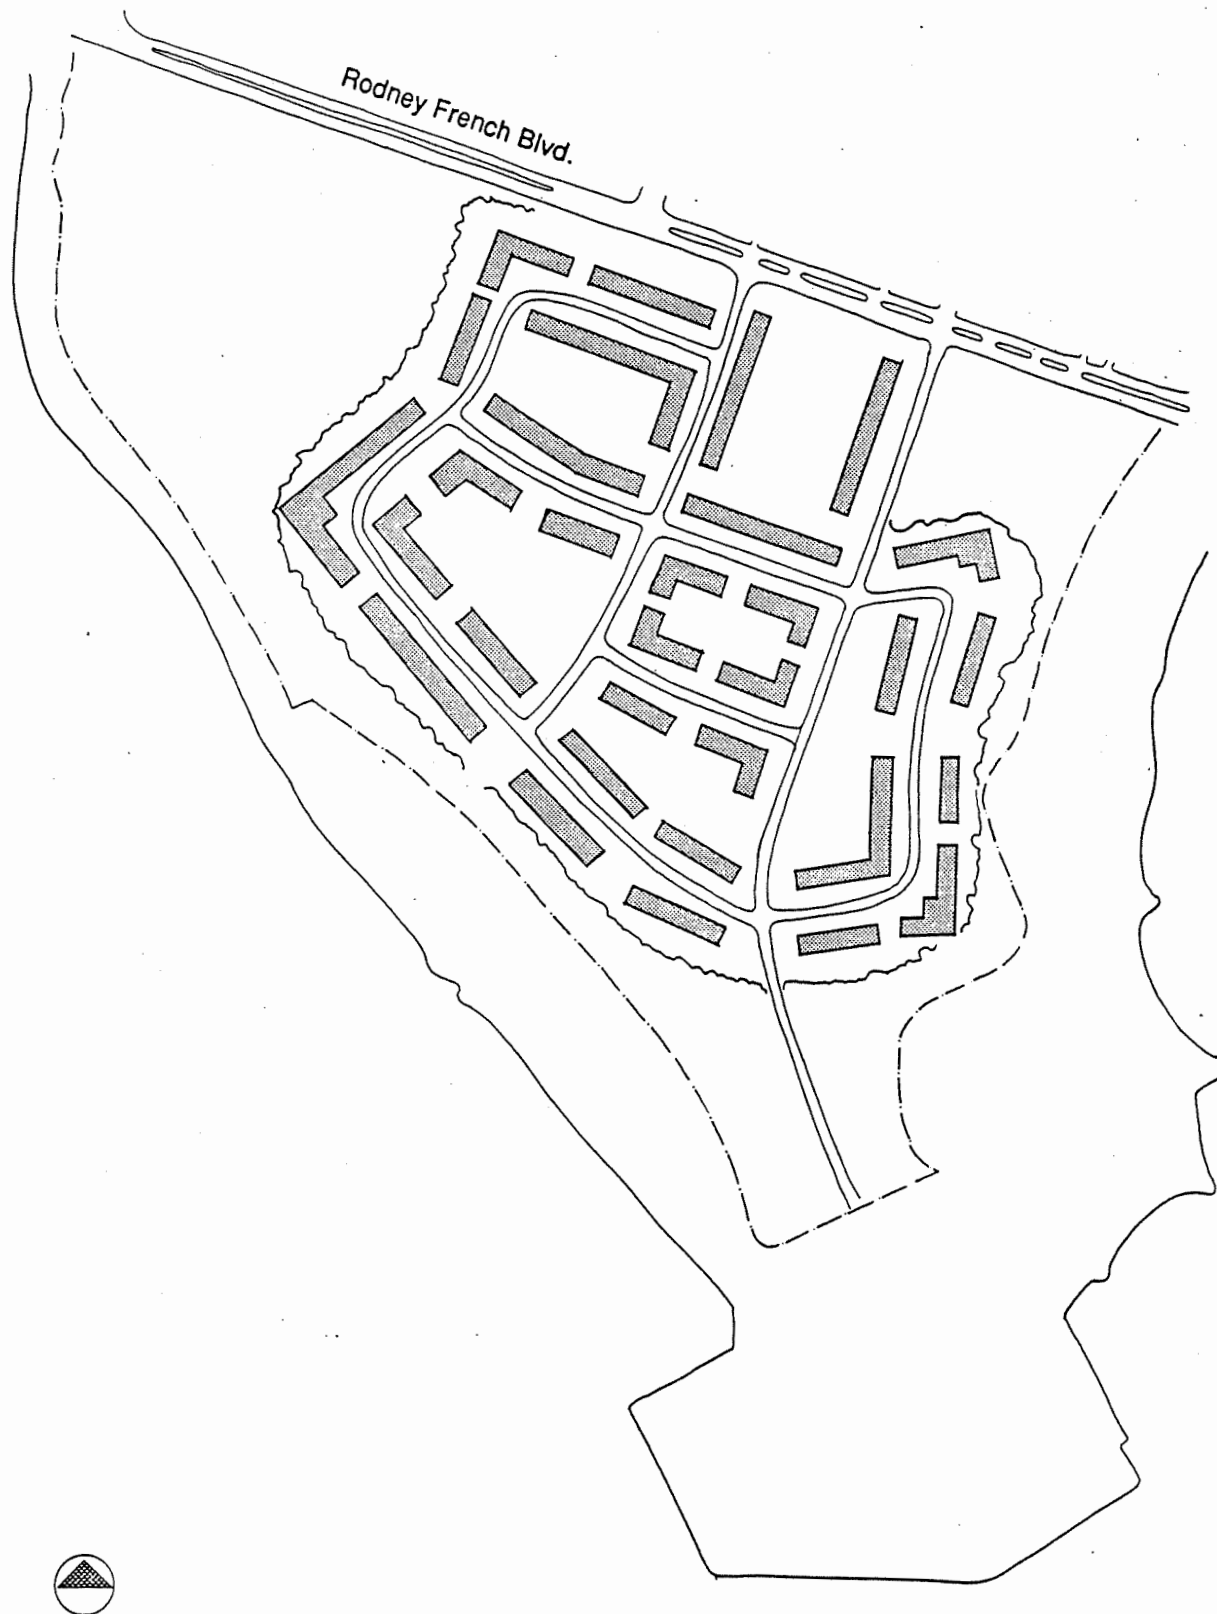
Illustrative Site Plan of Residential / Recreational Use on Site 1A
